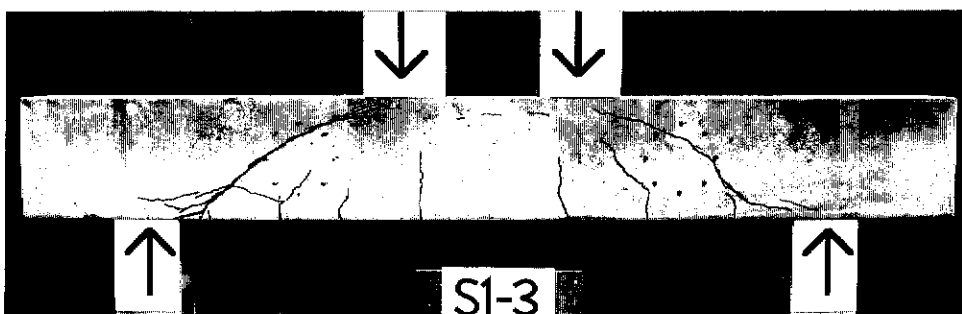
Crack Pattern of the Back Face of Beam S1-3
